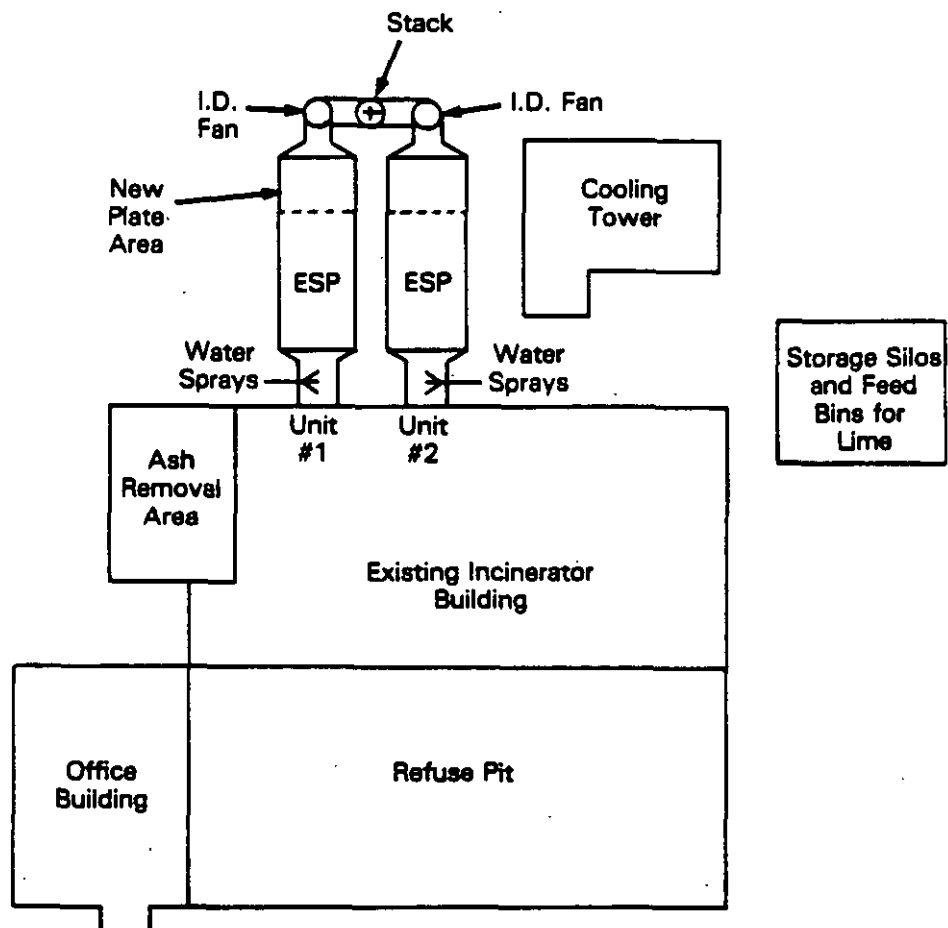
Plot plan of dry sorbent injection retrofit equipment arrangement.
